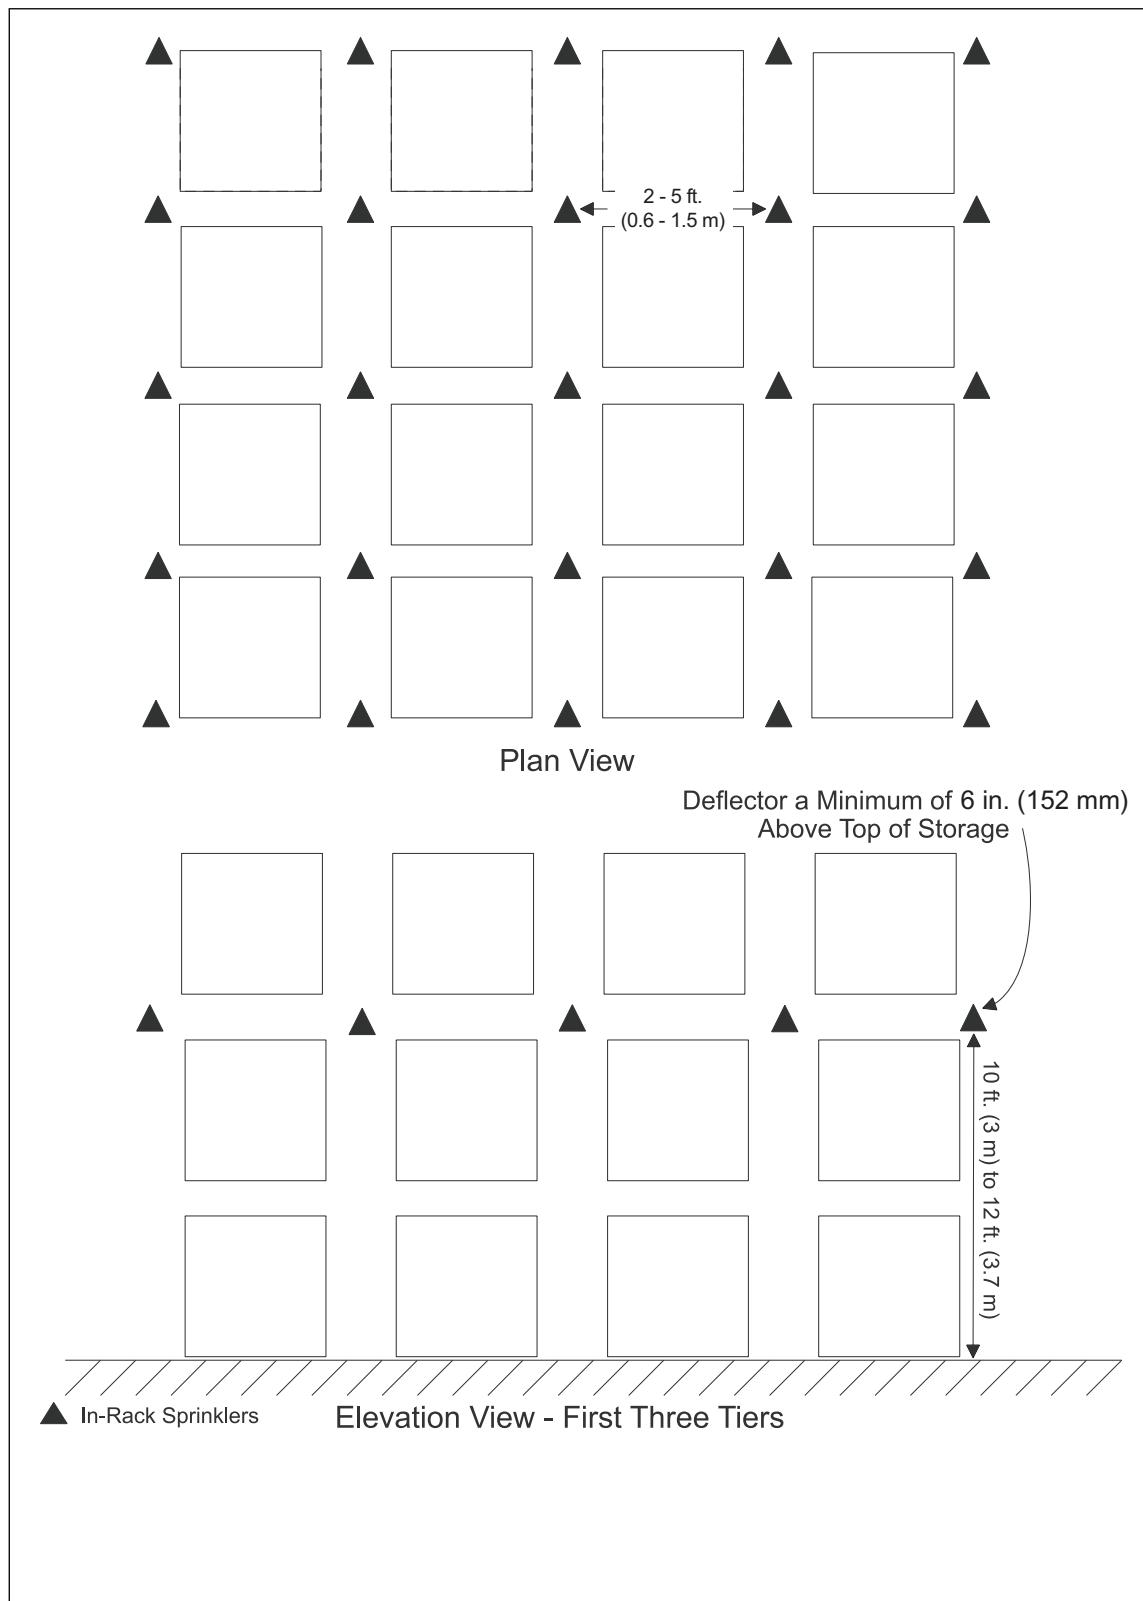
Multiple-row rack sprinkler layout: fire protection scheme B
